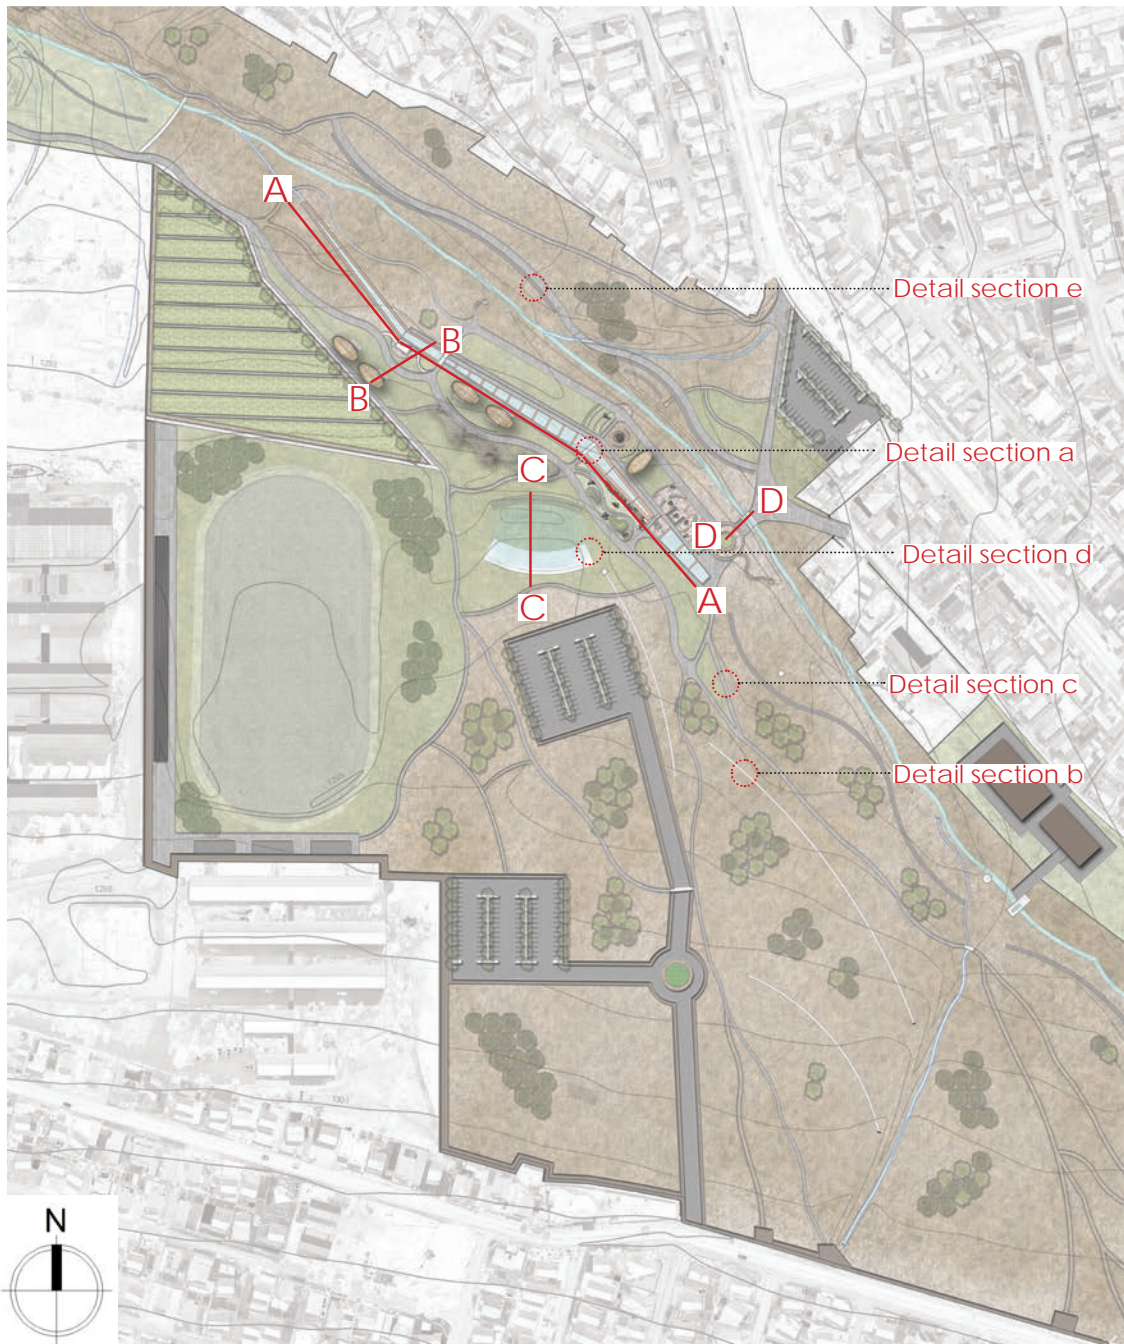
Master Plan indicating section lines and sections details (Author, 2018)
